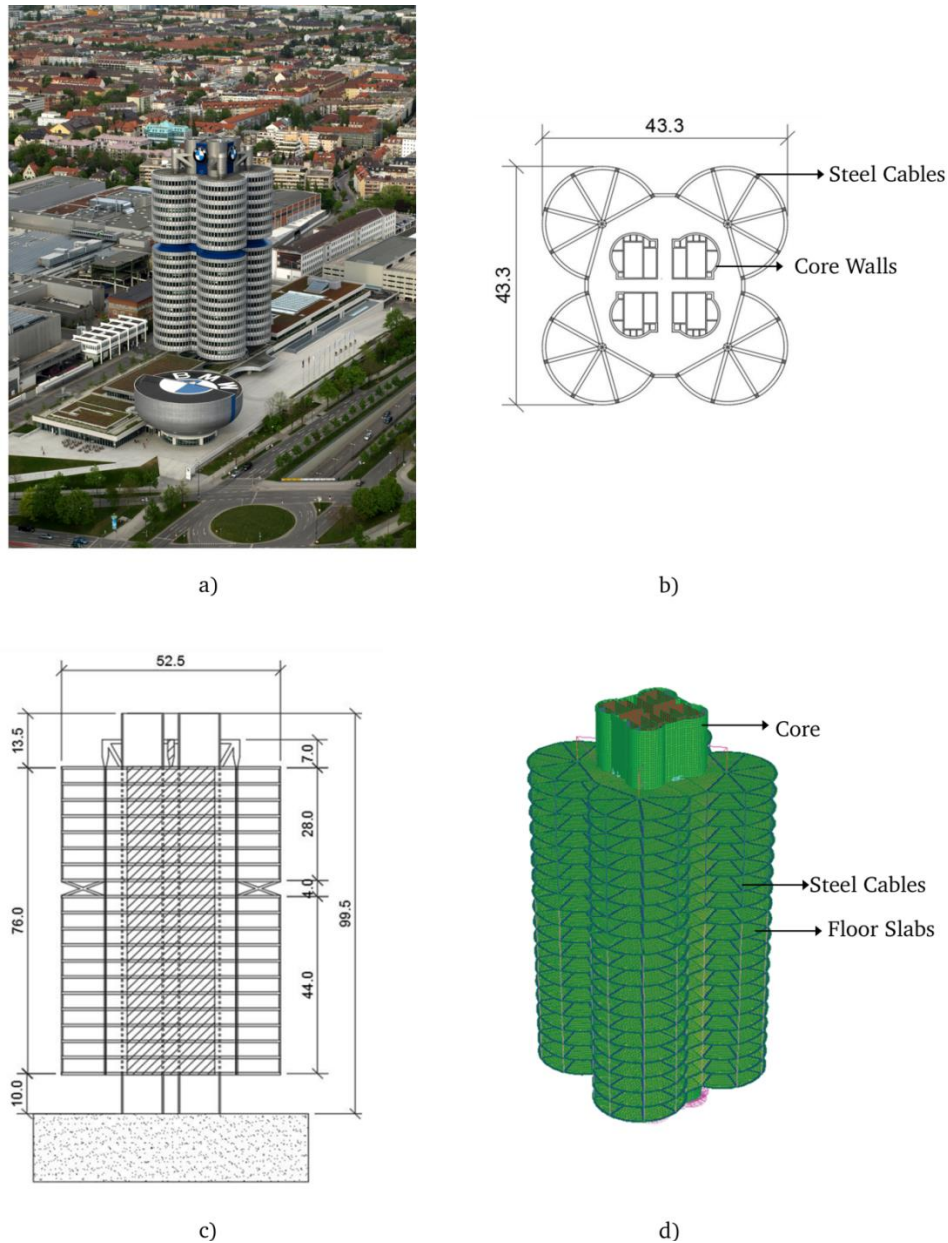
a) BMW building [22] b) Plan [23] c) Elevation [23] d) Modeled structure [23]
